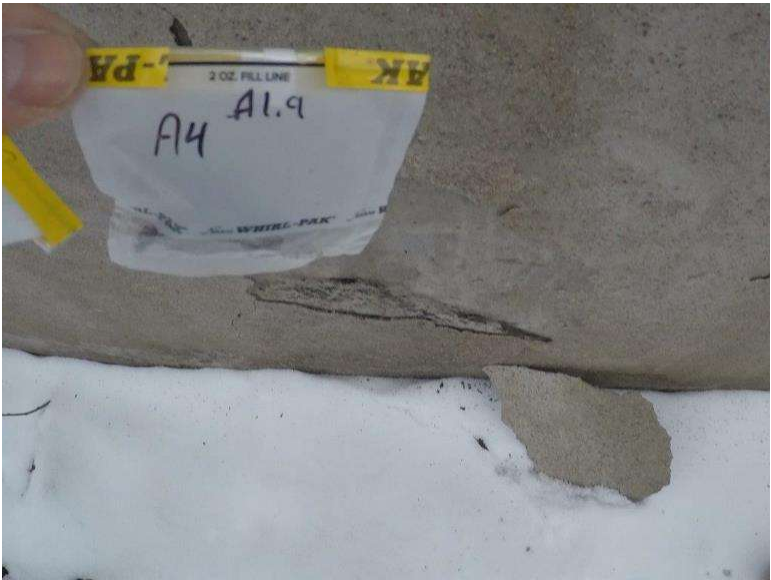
Site 1.9 Crandell Campground Interpretive Theatre
